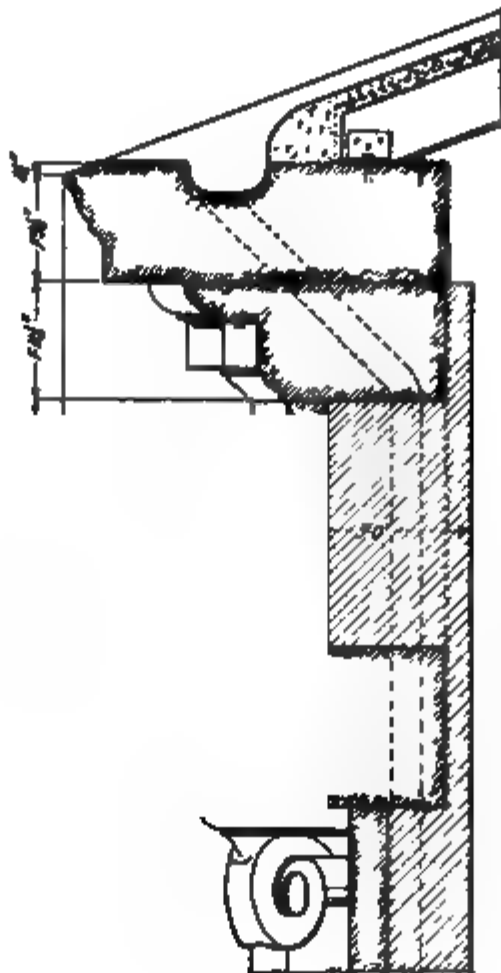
Terra cotta cornice on reinforced concrete building.
